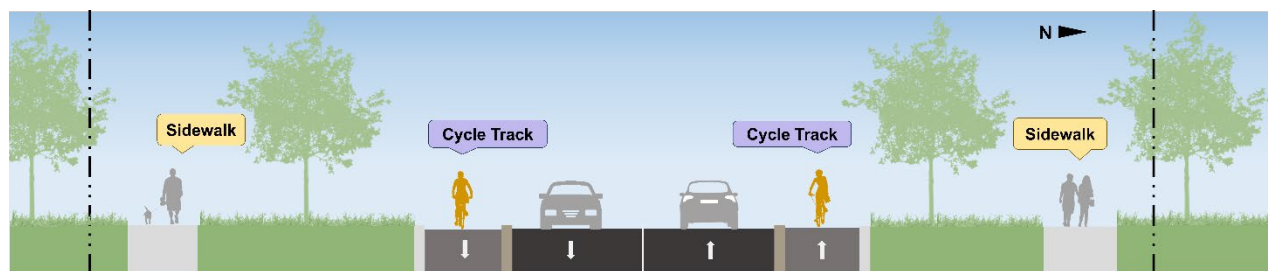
Penlea Avenue Proposed Cross-Section - Kipling Avenue to Taysham Crescent
